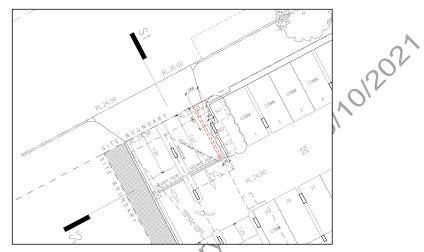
Extract of the proposed basement plan indicating the location security door and intercom to gain access to the basement car park.
